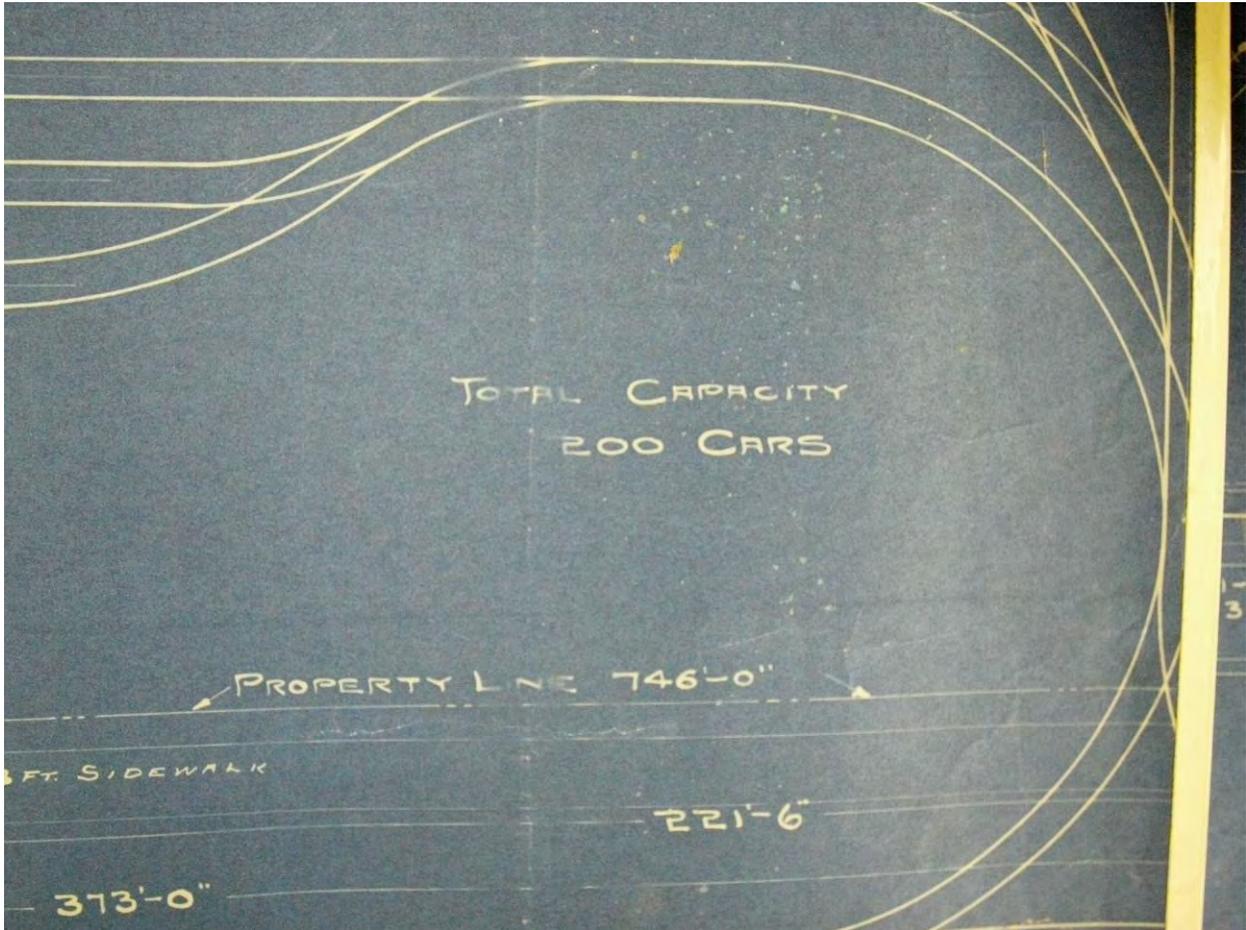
Original plans indicate the site was designed to hold 200 streetcars, source: Northwest Architectural Archives
